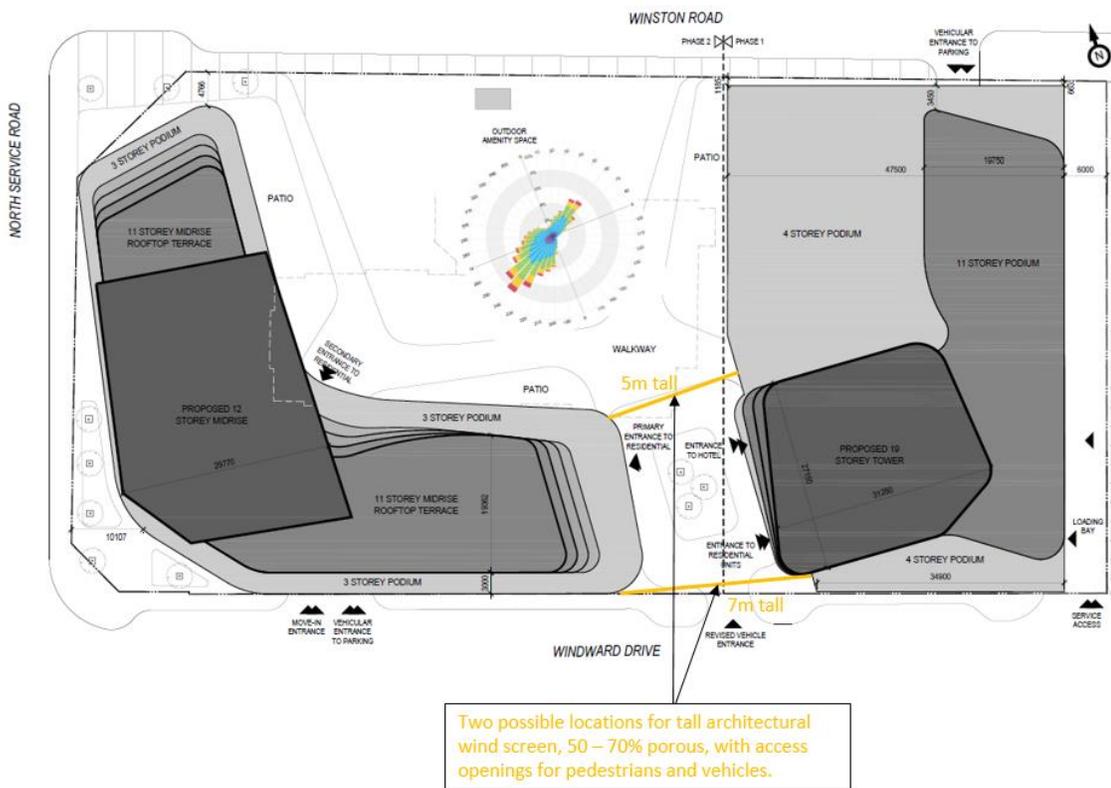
Proposed Site Plan Showing Entrance Locations and Wind Control Concept
